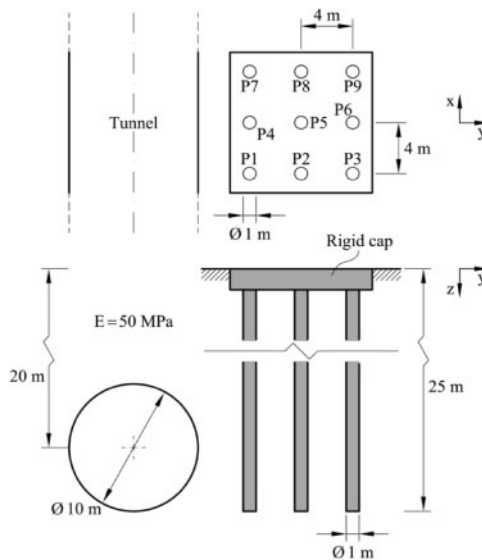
Geometry of a solved example: Interaction between a tunnel construction and a  $3 \times 3$  capped pile foundation.
